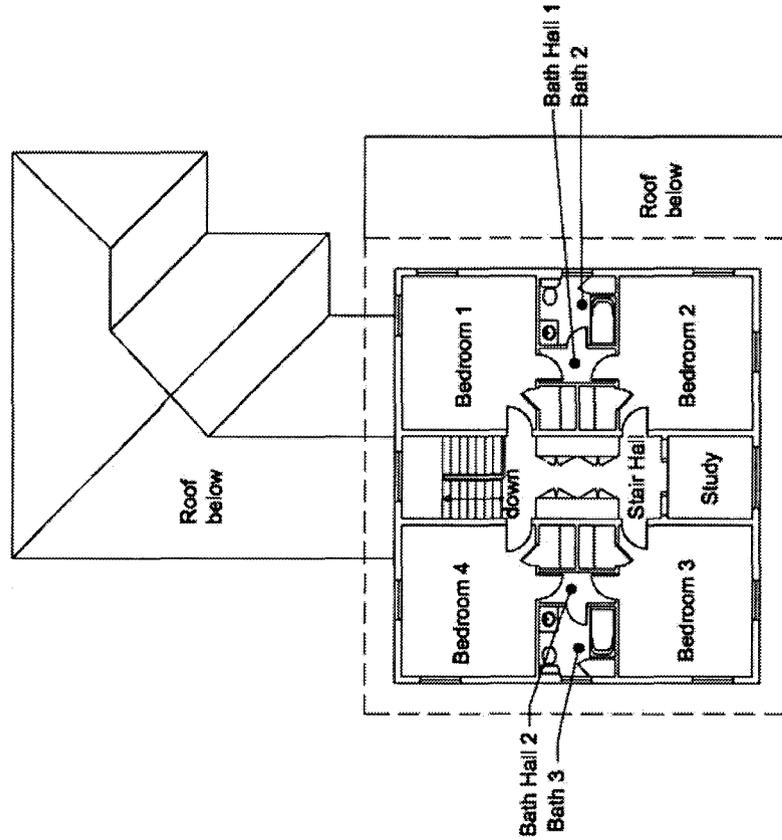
, dated January 7, 1949 (rear wing floor plan - Facility No. 201)
